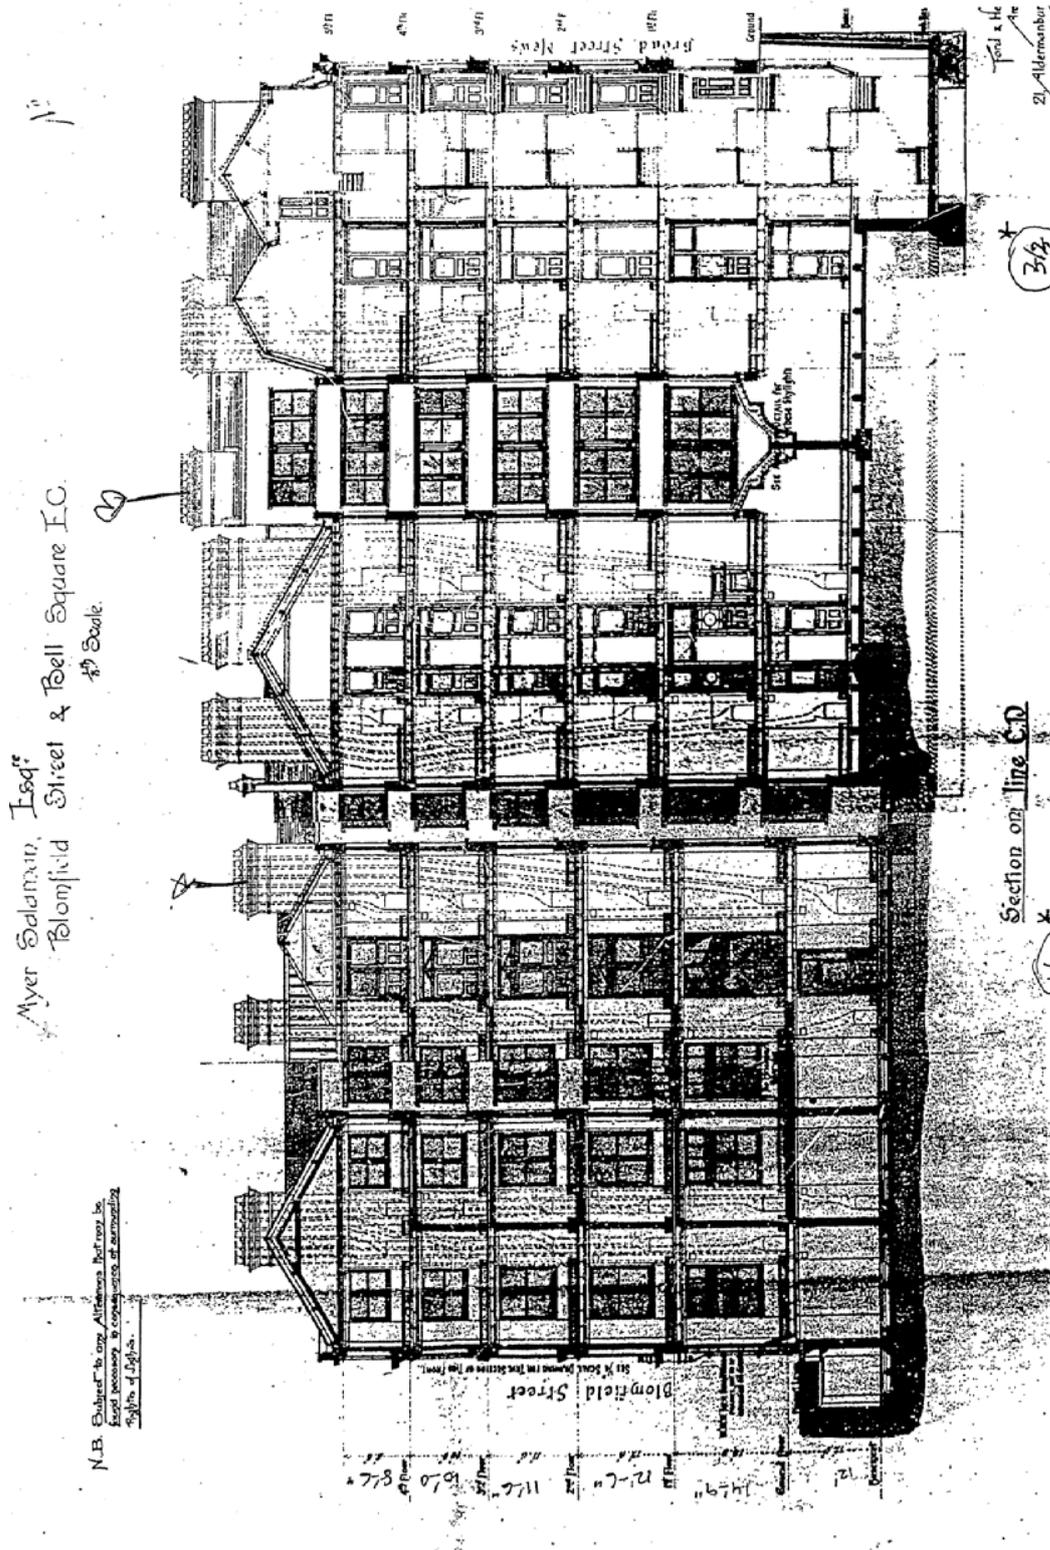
A west-east sectional elevation c1887, supplied by the Crossrail
